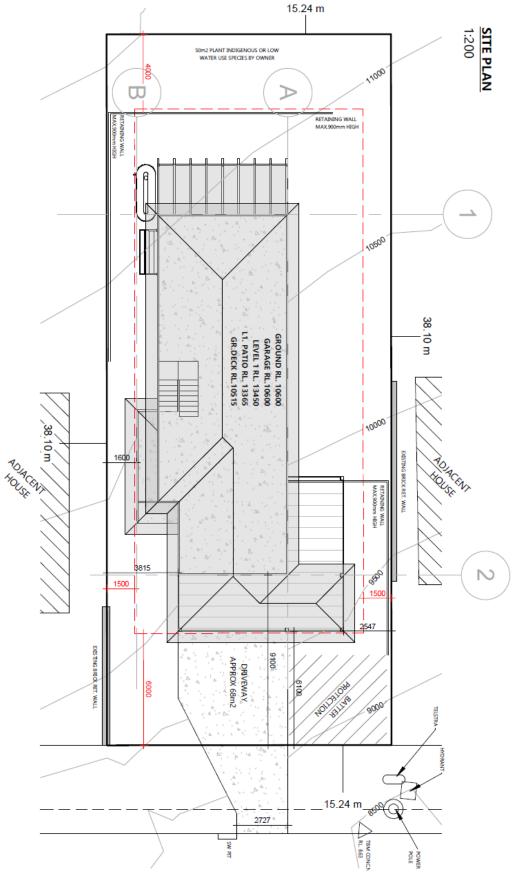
Site Plan Extract – Source: Client. Not to Scale. Marine Drive to bottom of plan. North (approx.) to right of page.
